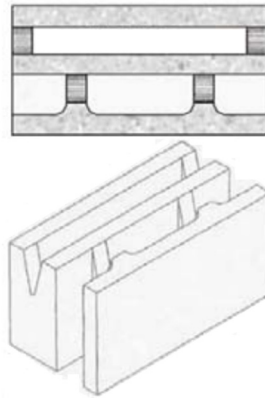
Concrete units used in dry-stack system [Source: Murray 2007, recreated with permission].
